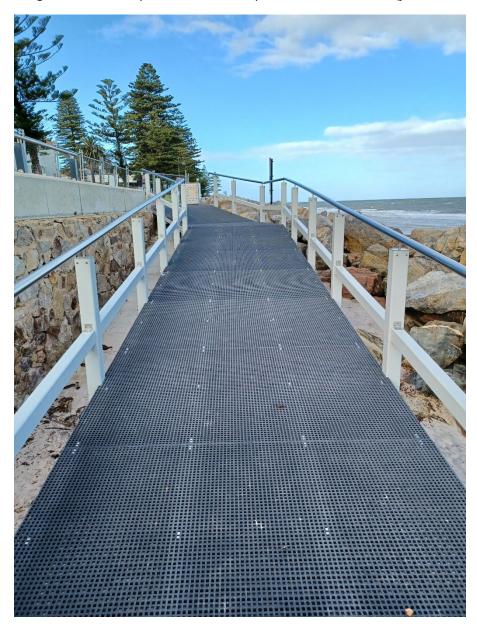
New non-slip beach access ramp at near Robert Street (just North of the Broadway)
